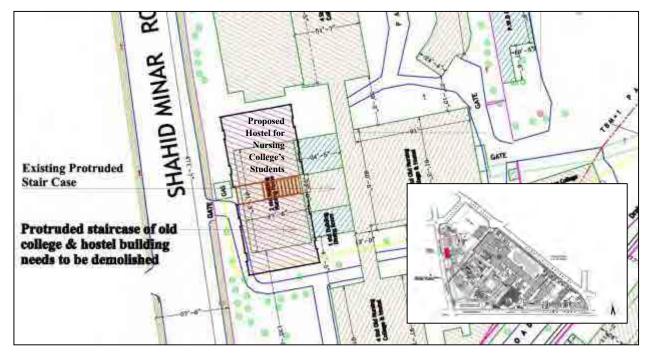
Candidate Site's Location and Layout Plan for Construction of the Nursing College Hostel in Dhaka Medical College Campus
